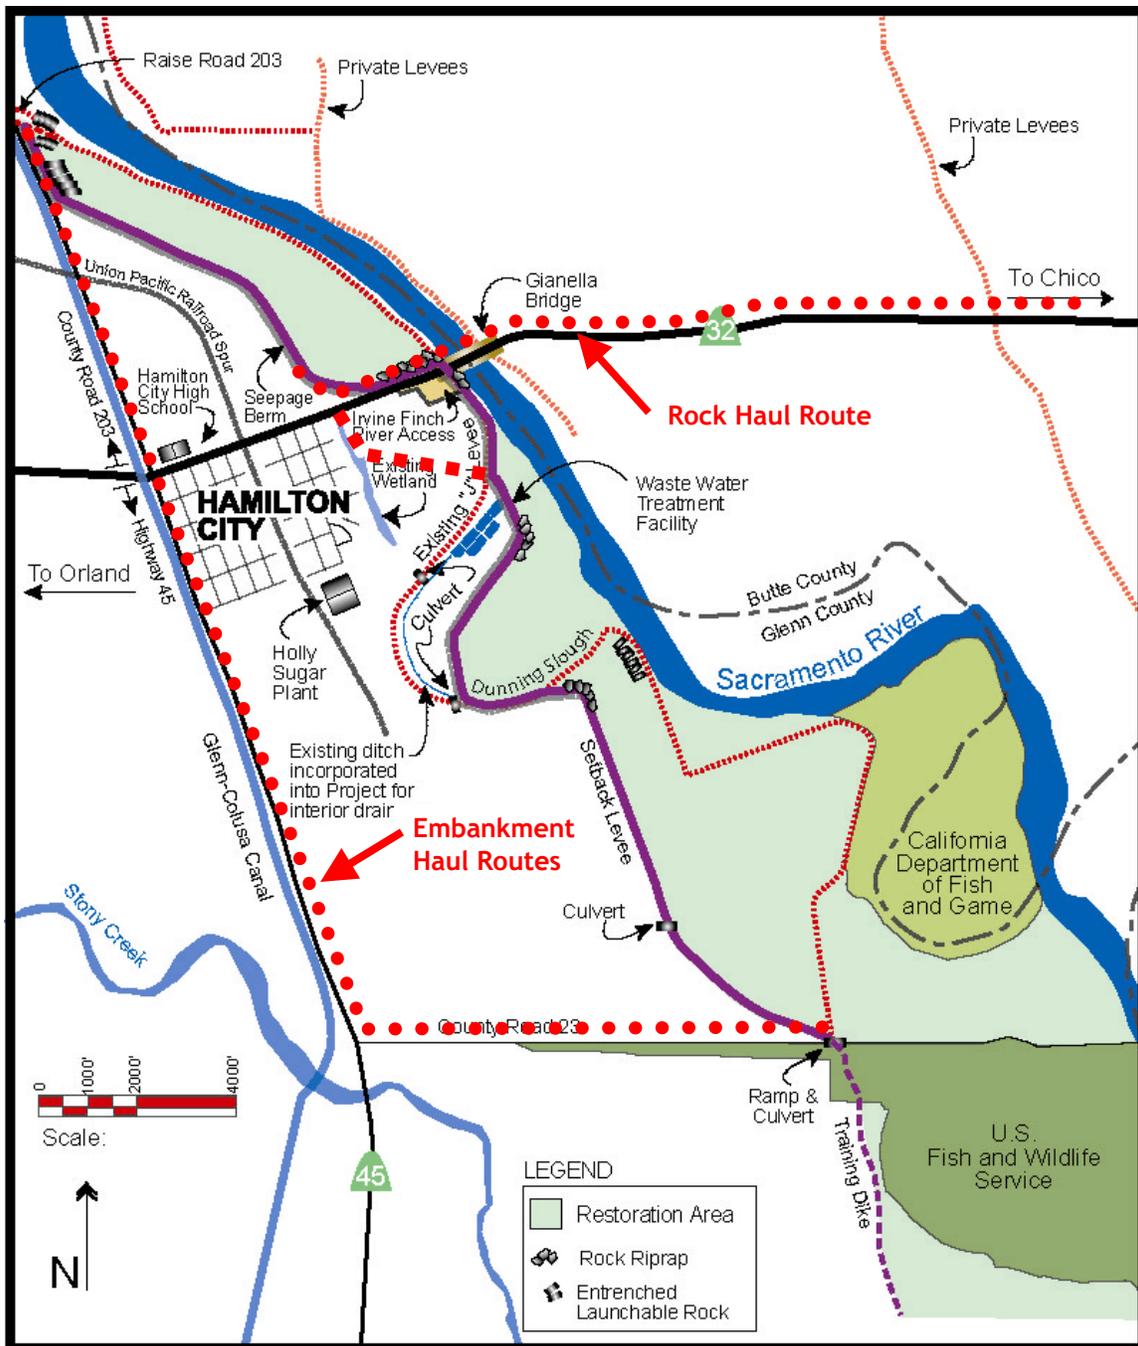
Embankment and Rock Haul Routes Within the Project Area/Site
